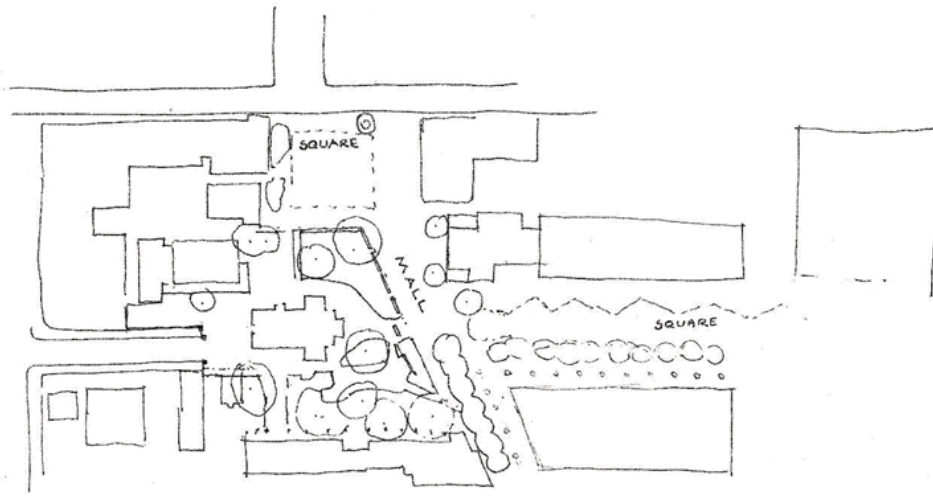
Plan showing the church and its location within Parramatta Square (Source: HAA)
